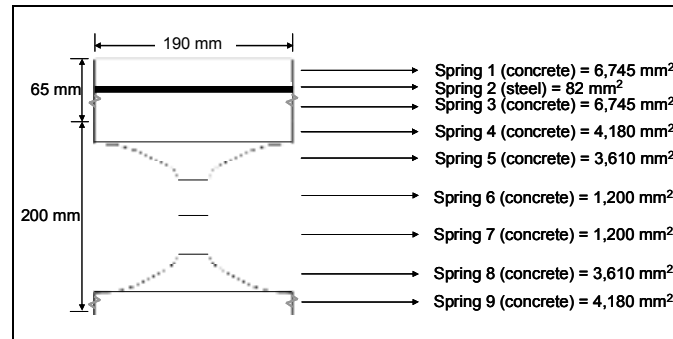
Division of the hollowcore slab cross-section for simple connection (white segment: concrete; black segment: steel)
